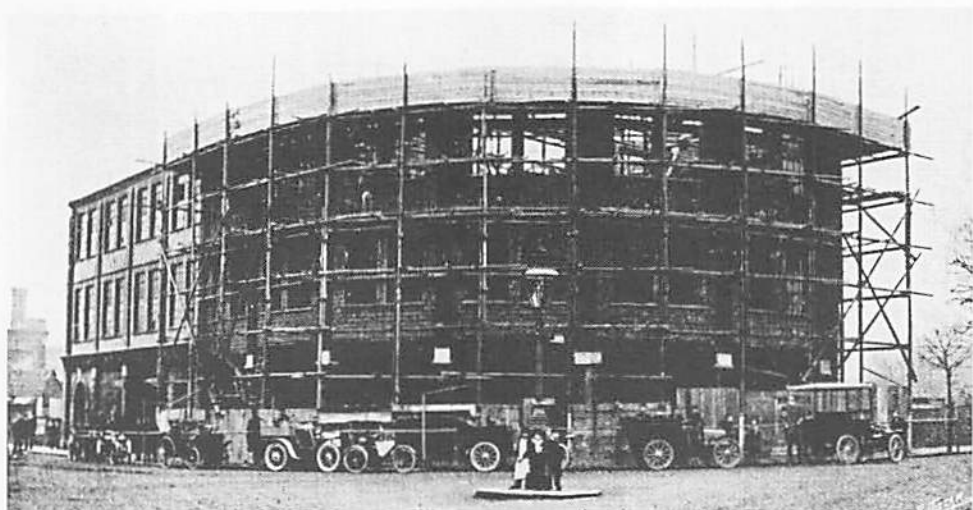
The first part of the factory on the corner of Onslow Street and Bridge Street under construction, 1902 (GMR 1463).
